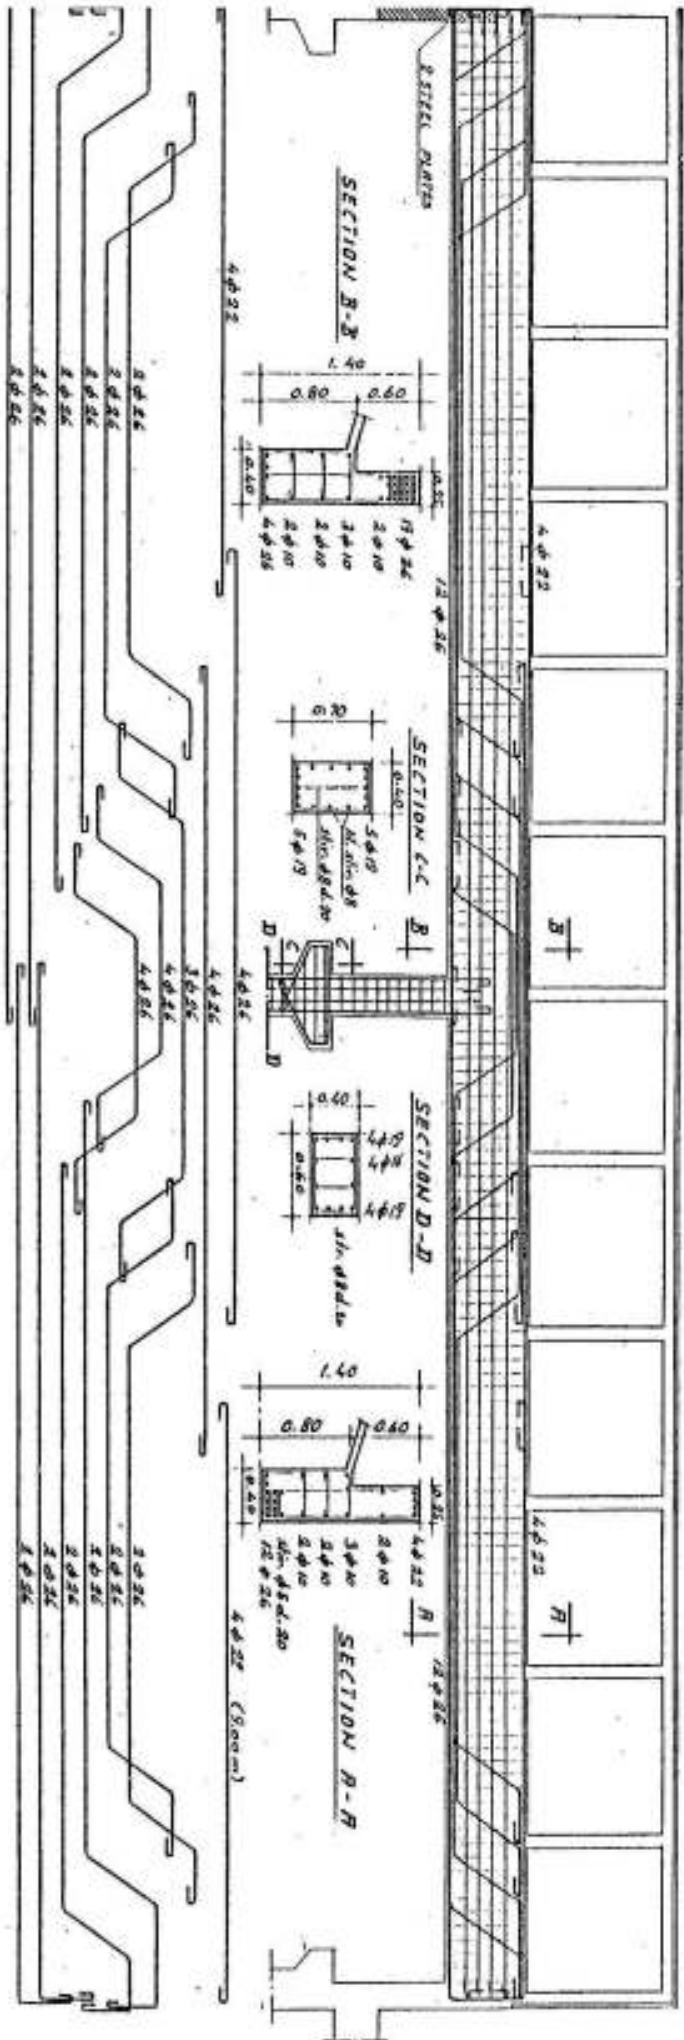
Cross and longitudinal sections of factory 135 at Helwan
